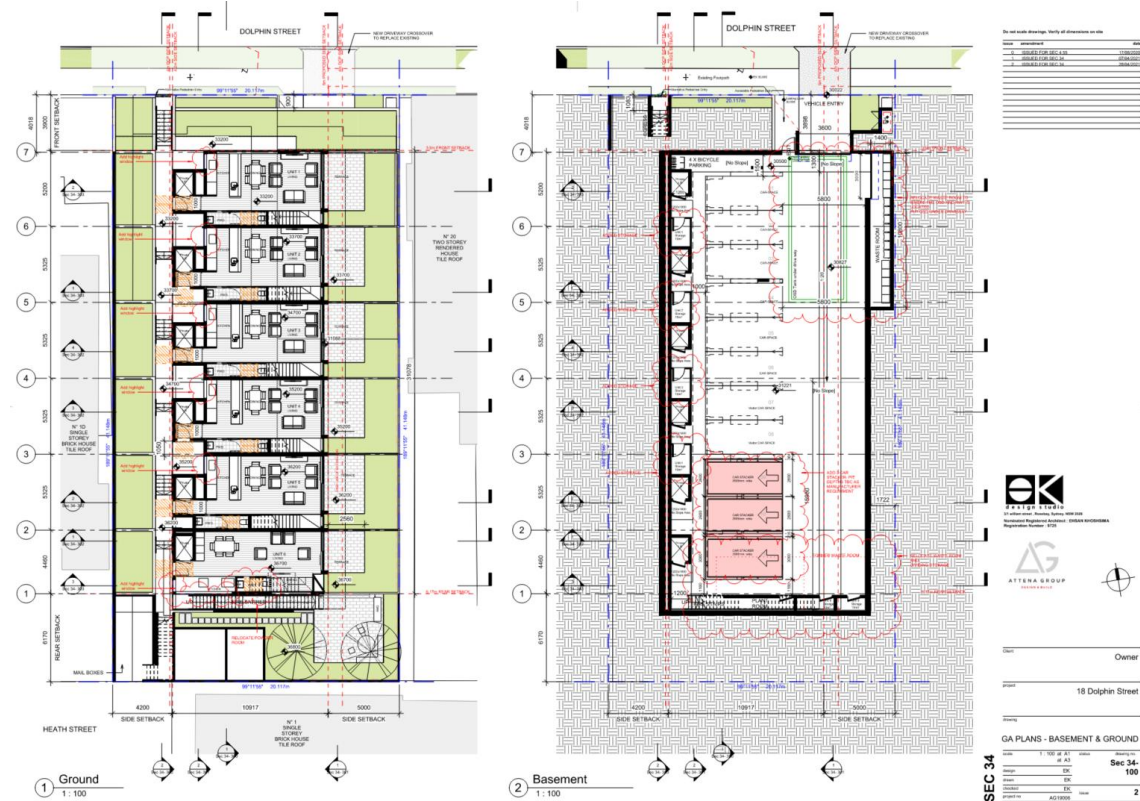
Ground and basement level plans approved under DA/371/2019/A (Source: EK Design Studio)
